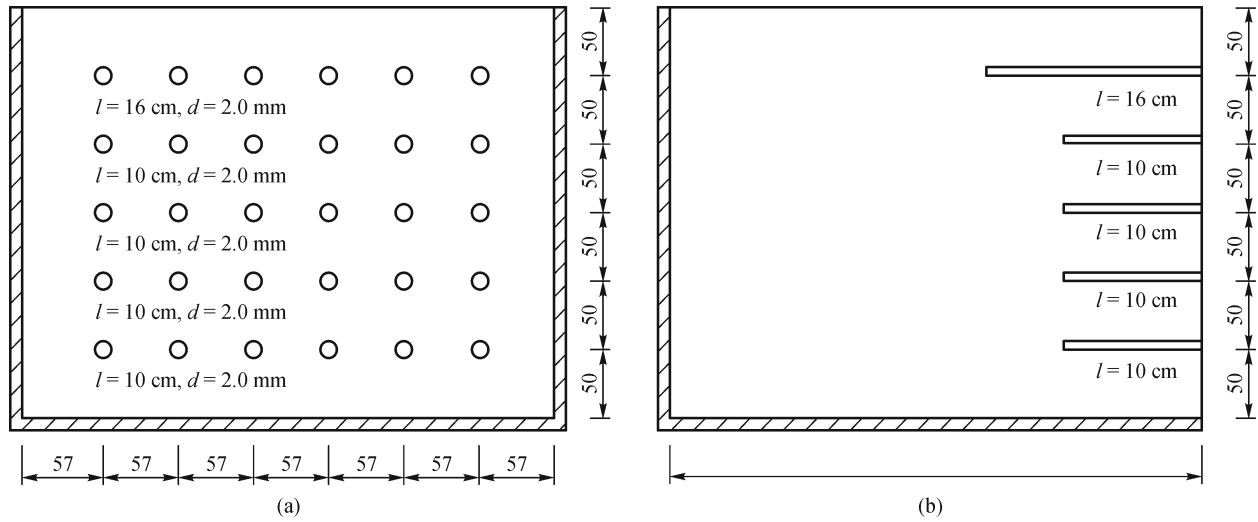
Arrangement of bolt. (a) Elevation view of bolt arrangement; (b) profile of bolt arrangement (case 6, unit: mm)
